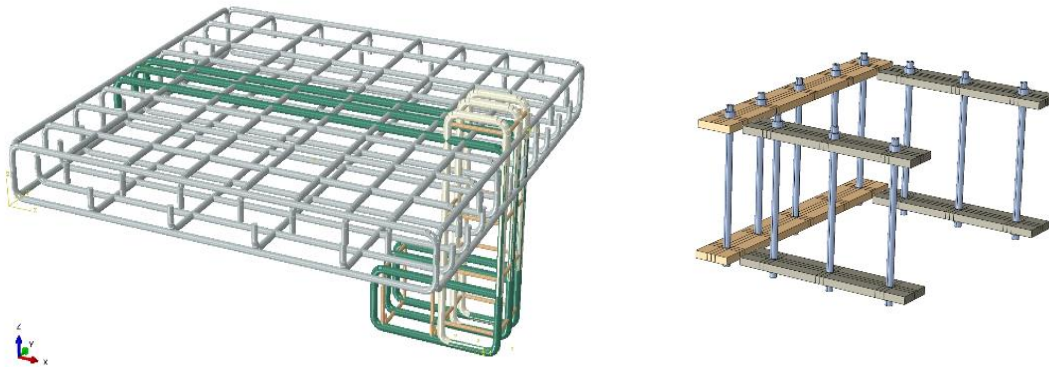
Flexural reinforcement and steel links modeling as truss element steel plates modeling as solid element.
